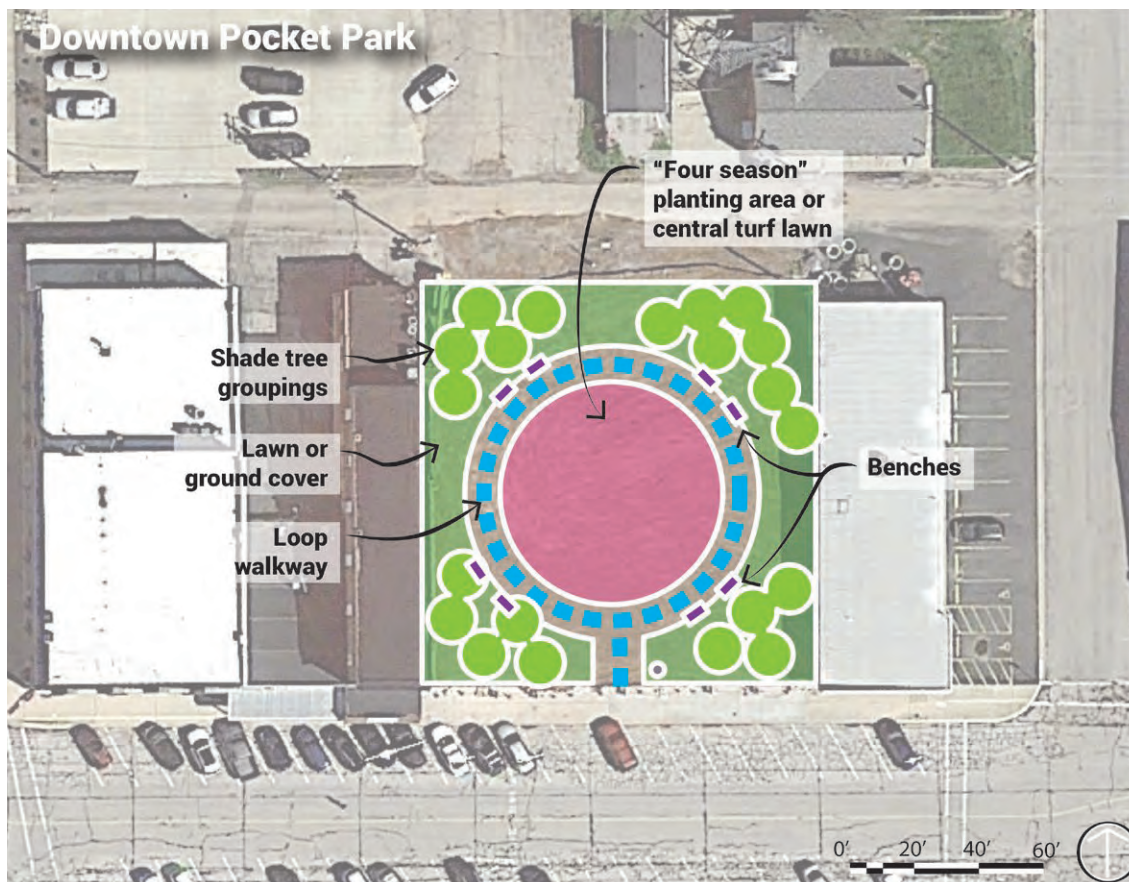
Master plan improvement recommendations for the New Downtown Pocket Park
